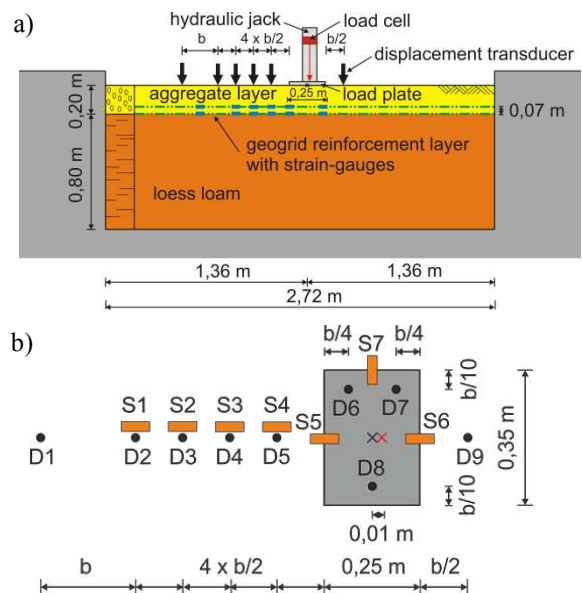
Setup and arrangement of the LVDTs and strain-gauge: a) cross section, b) Ground plan of load plate and measurement devices
